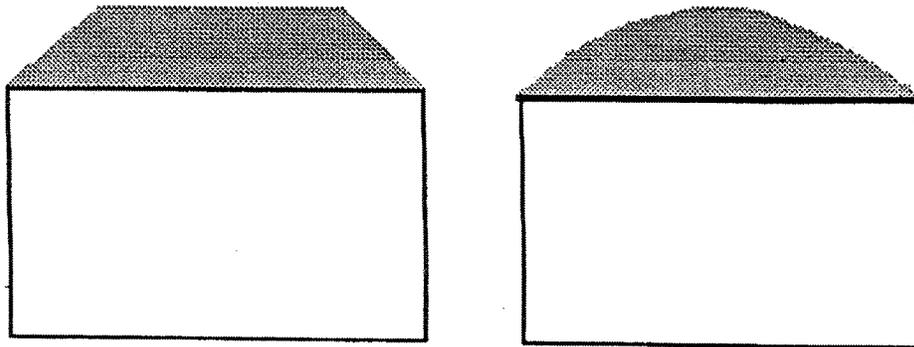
(left) and 1b (right). Cross Sections of Coal Hoppers with Trapezoidal Profiles (1a) and Rounded Profiles (1b)
